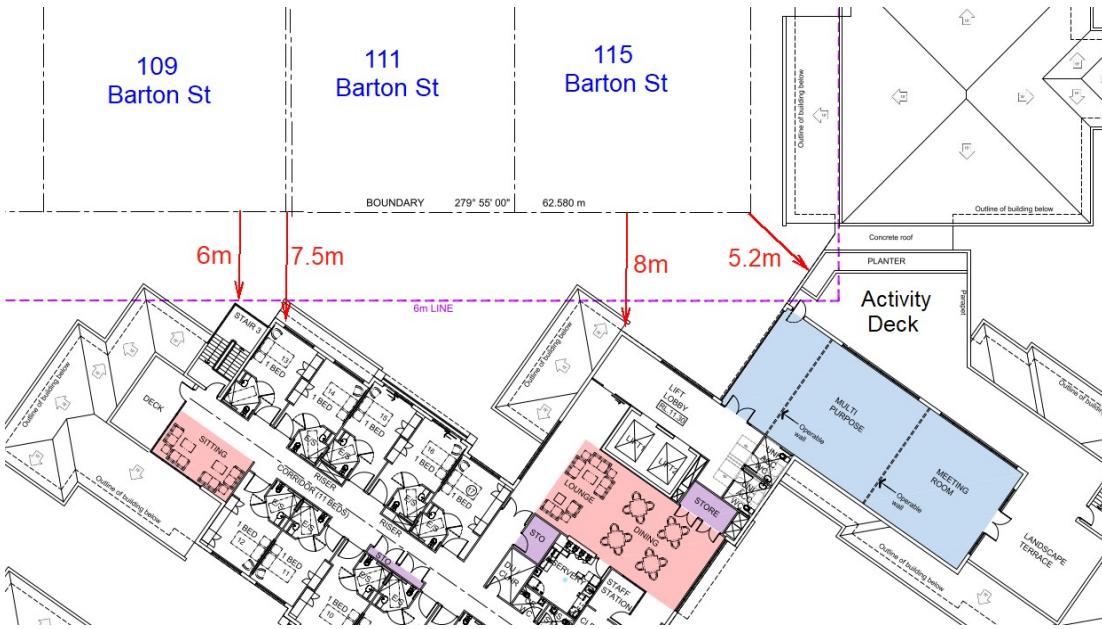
Setbacks for 3rd Floor of proposal to the rear of properties fronting Barton Street
